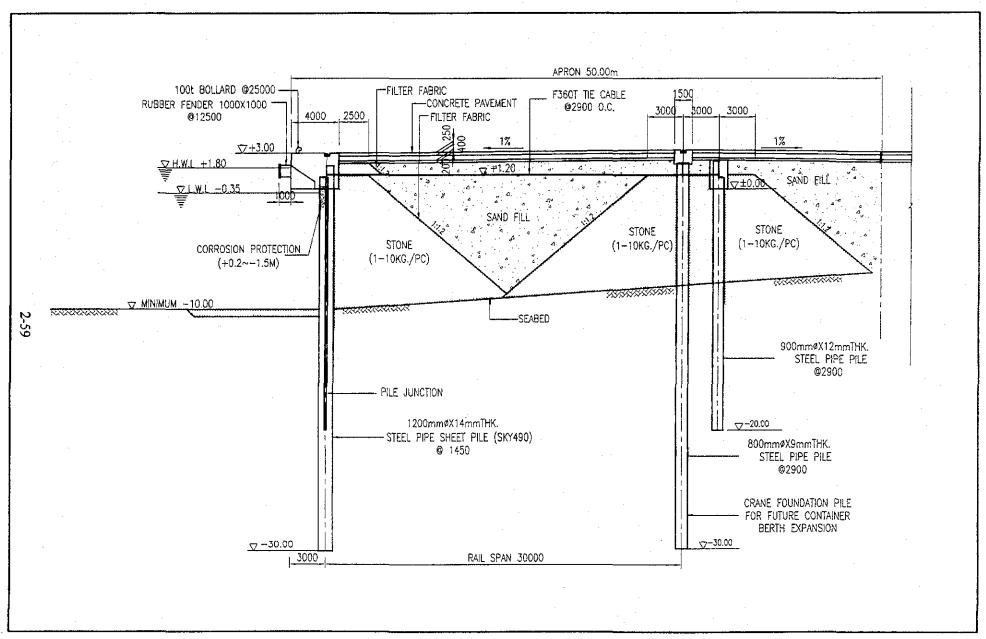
(2) Steel Pipe Sheet Pile Type Quaywall for Multi Purpose Berth
